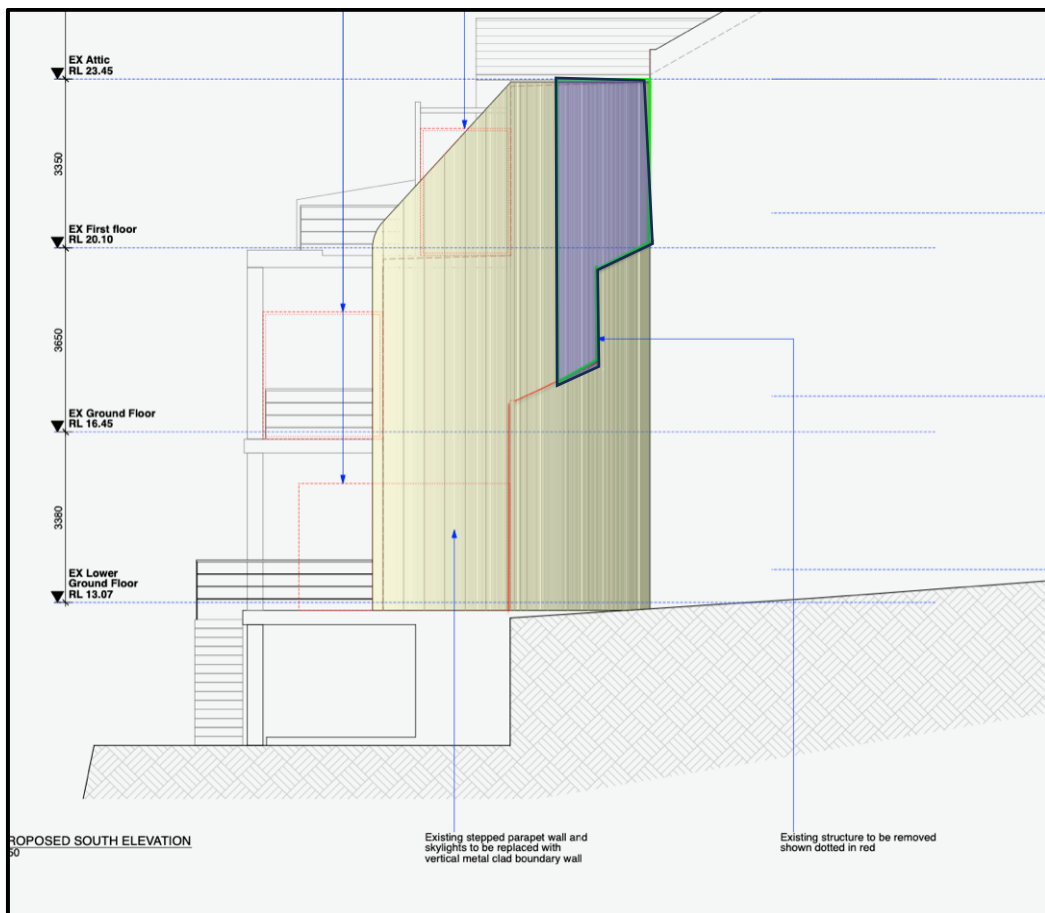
South elevation showing portion of the new/proposed southern wall with a nil setback (shaded in blue)
